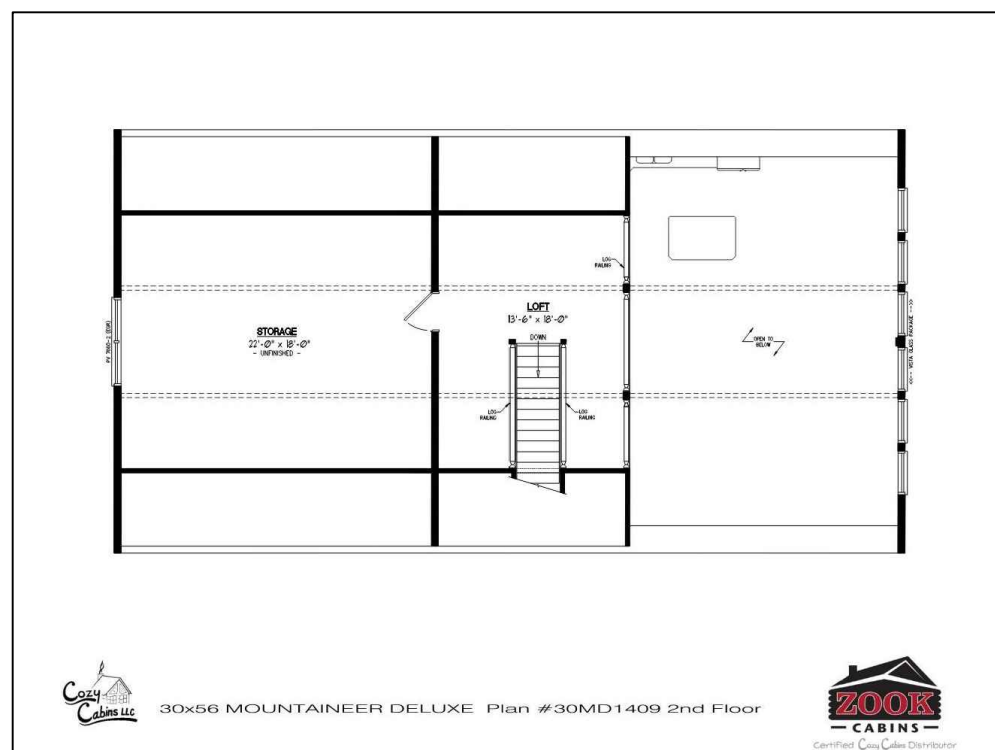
ZOOK "MOUNTAINEER DELUXE" CABIN UPPER FLOOR PLAN
